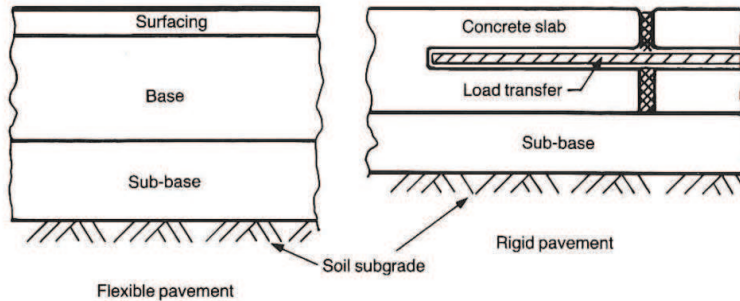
Typical structures of flexible and rigid pavements (Millard, 1993).
